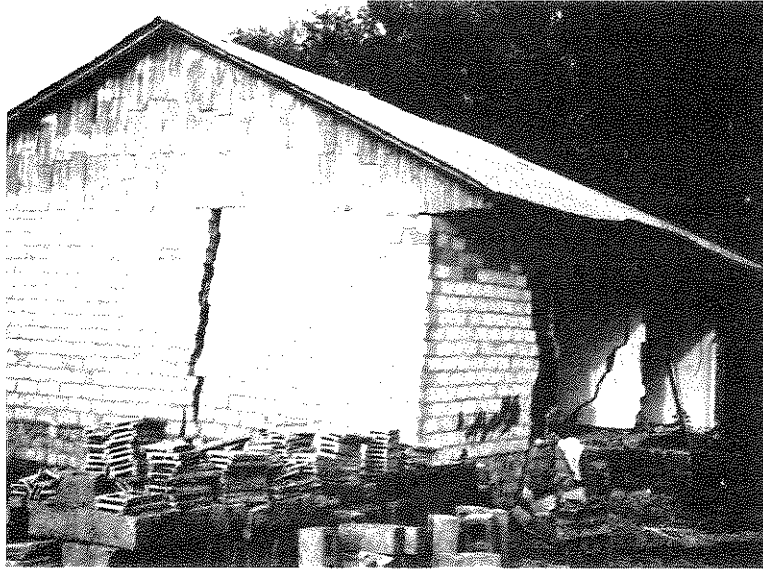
Wall crack caused by liquefaction settlement.
